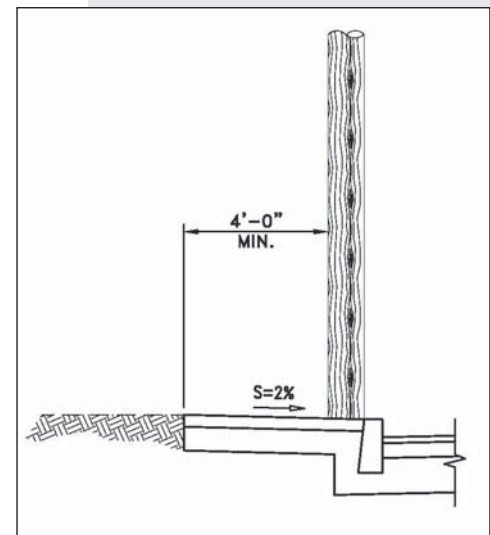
ADA Requirements for Typical Sidewalk Construction.
